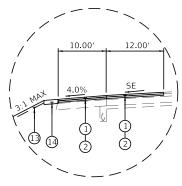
+00.18 TO STA. 1134+86.94
